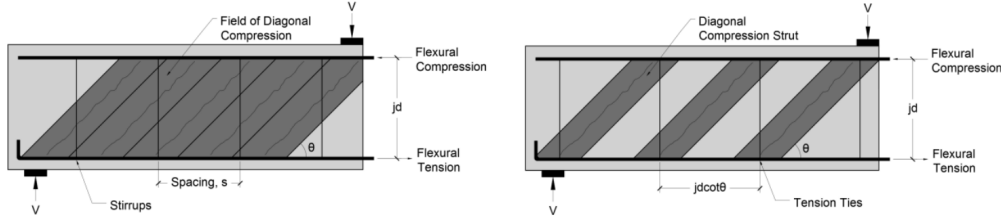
Diagonal stress fields and simplified truss model for reinforced concrete in shear
